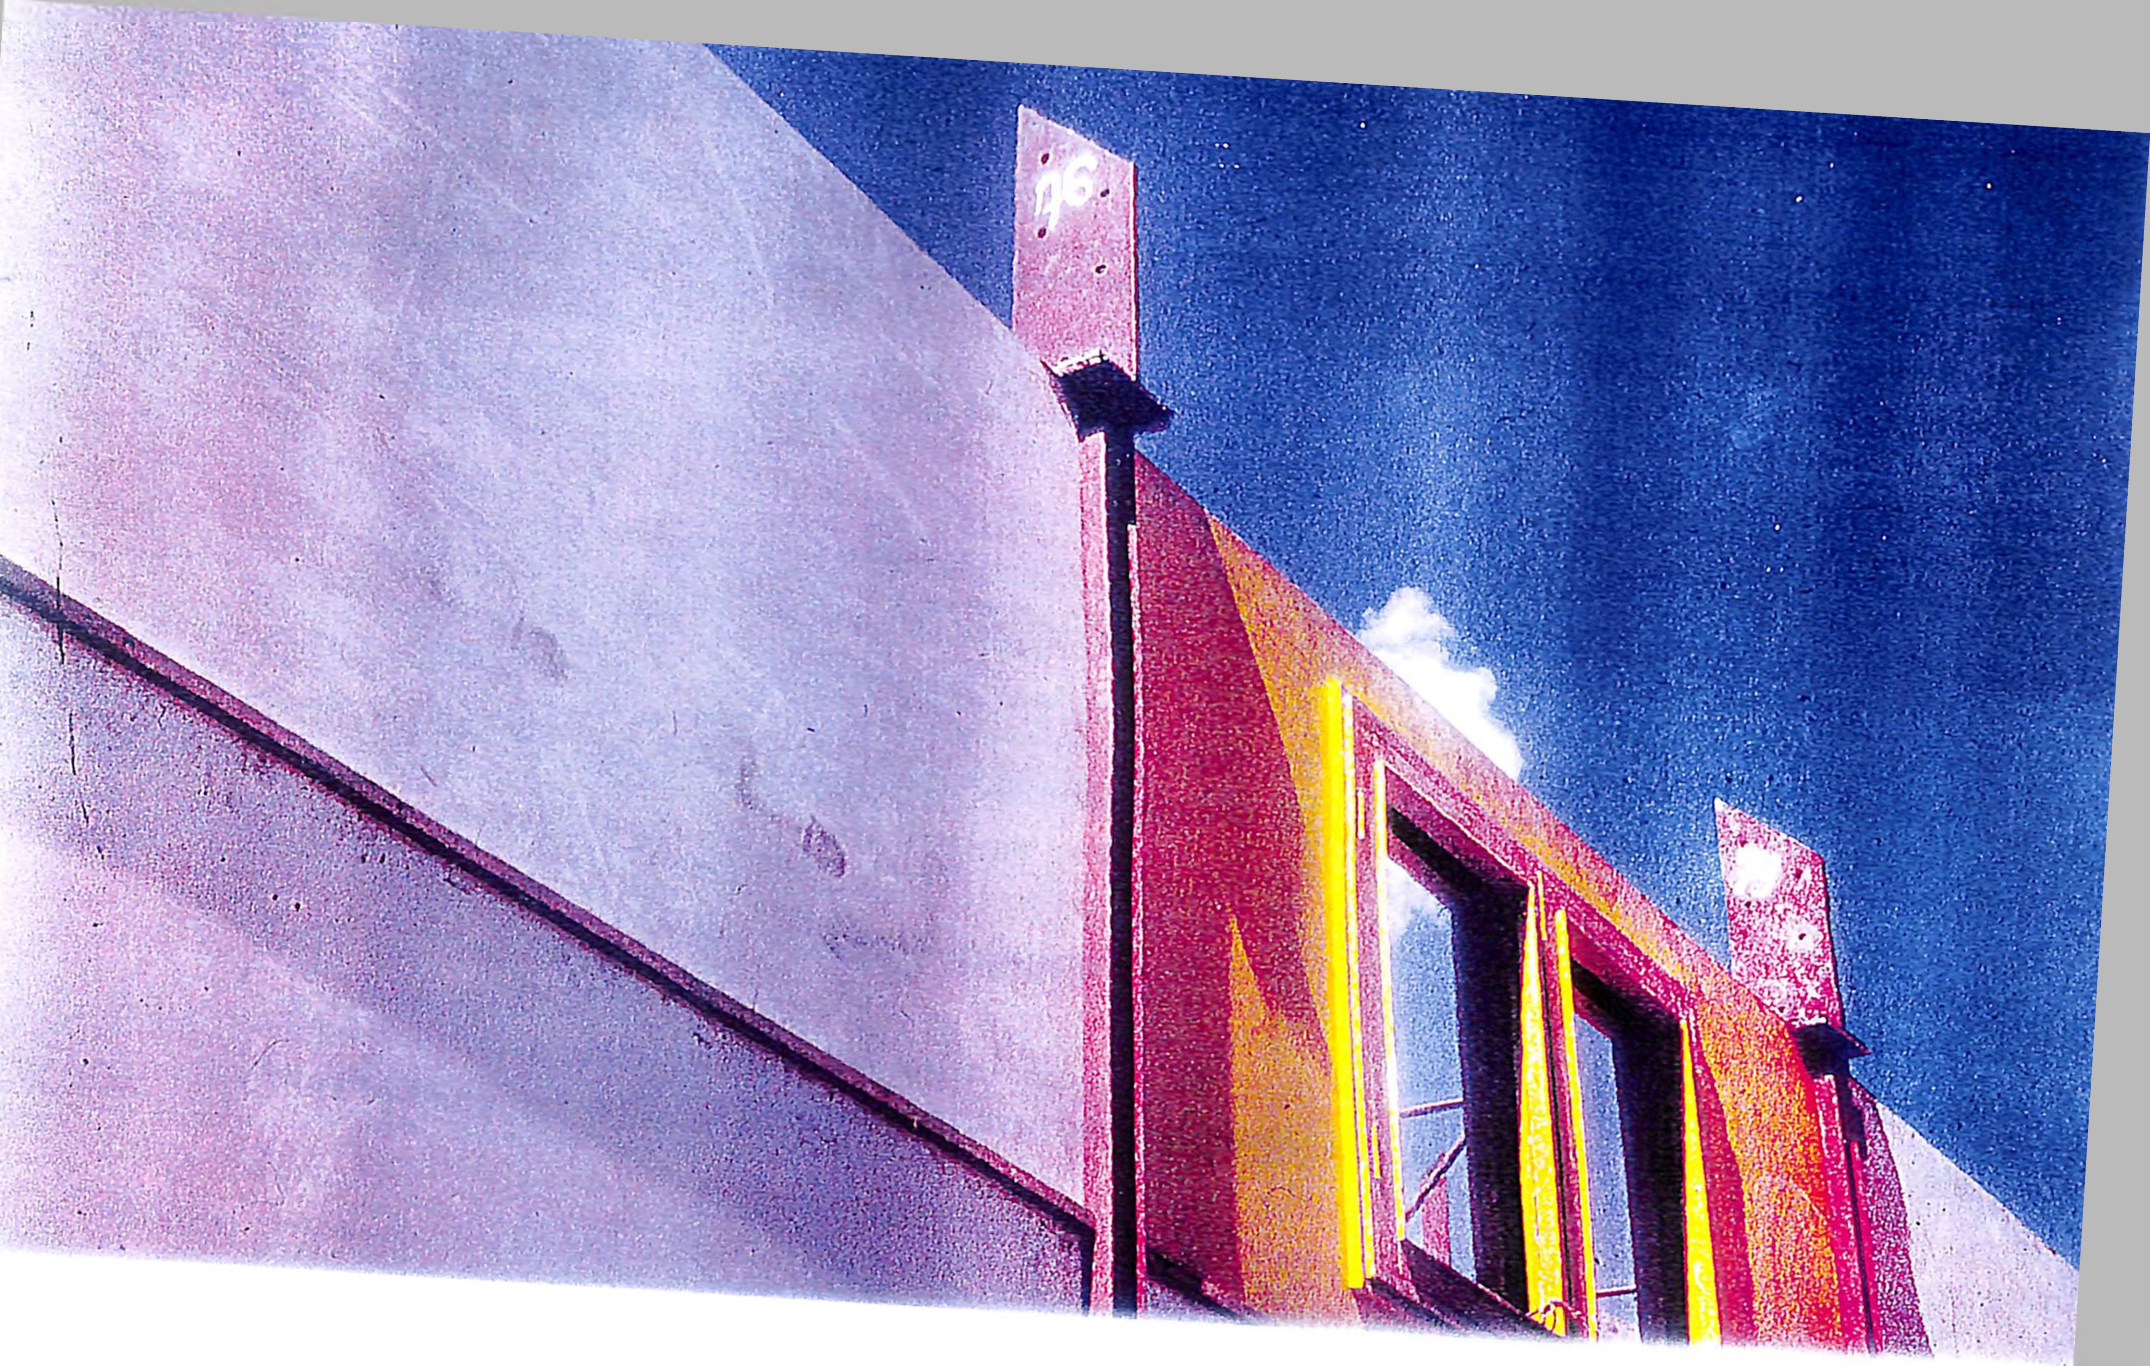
WALL AND WINDOW, SANDWICH PANEL
